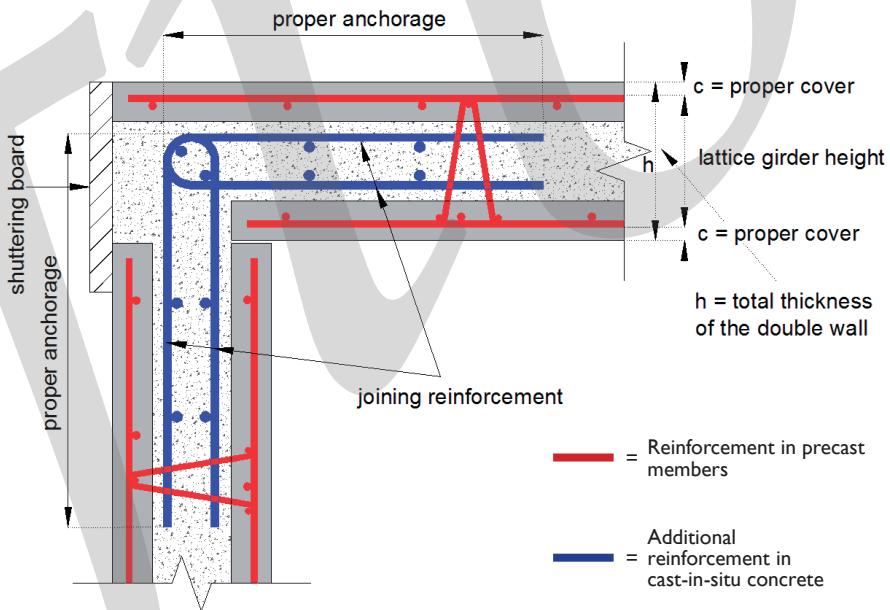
Horizontal section of connection detail for corner connection of double walls to satisfy direct anchorage lengths of additional reinforcement
